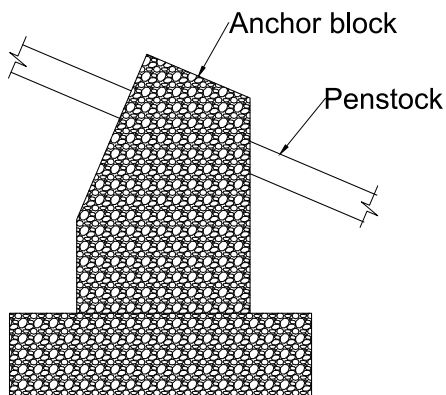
Anchor blocks designed to support penstock pipes in vertical and horizontal bends to support the structure (AutoCAD)
